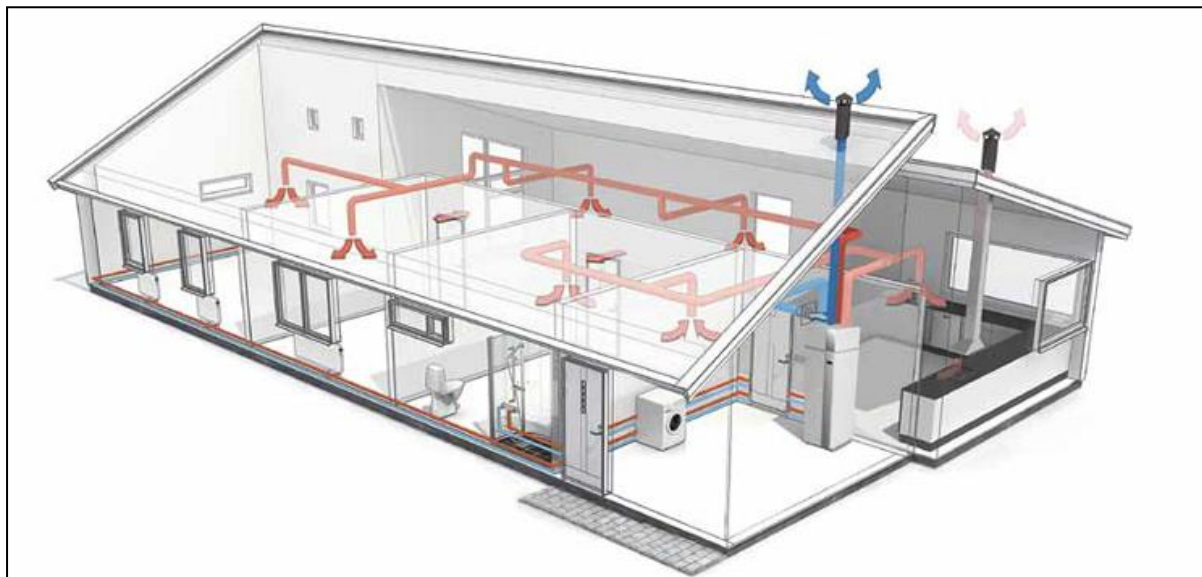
Example Diagram of Typical Exhaust Air Heat Pump Layout
